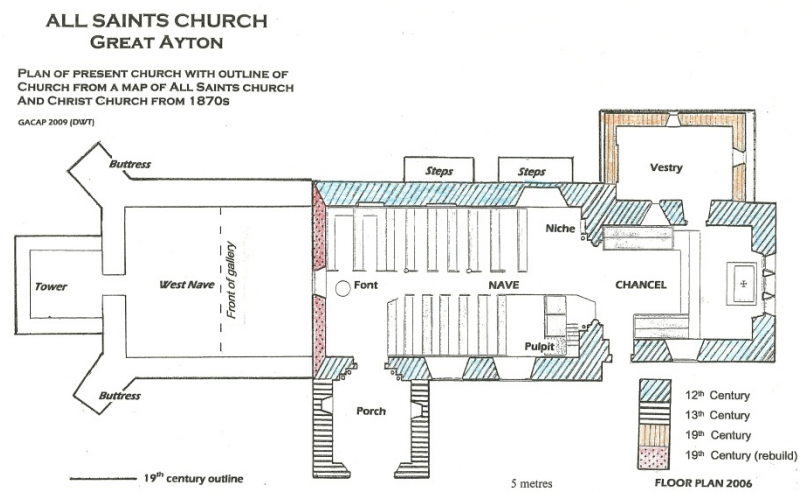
All Saints Church – Plan of present church with outline of western section, demolished 1880
